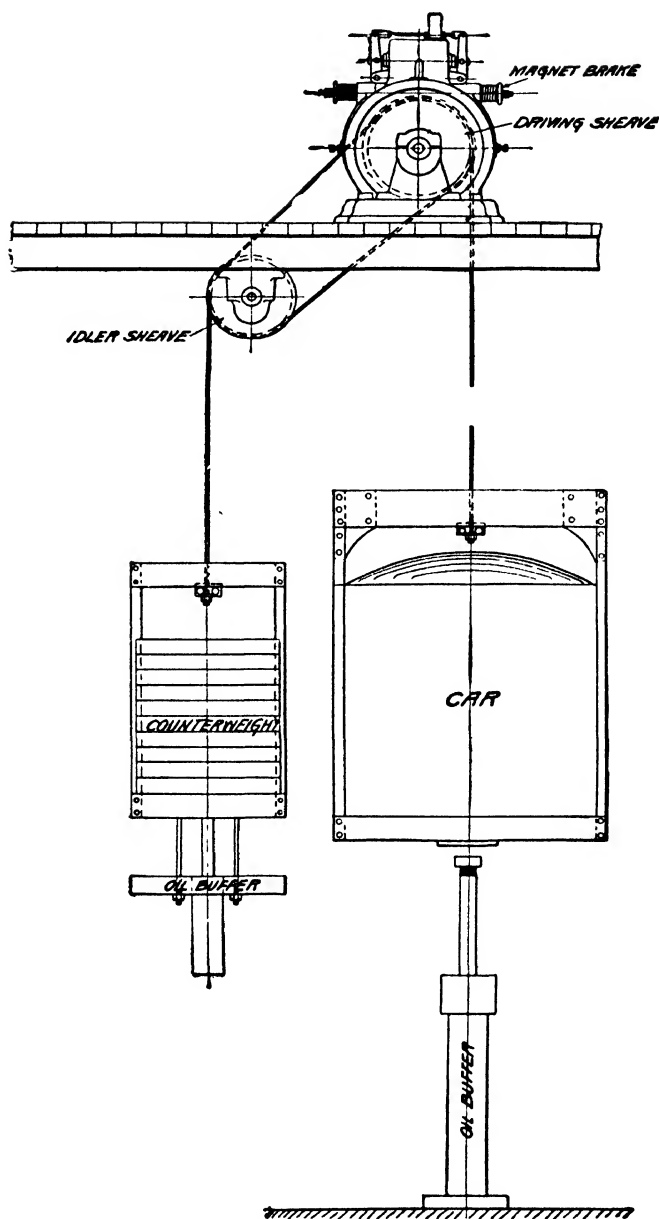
Diagram Showing General Arrangement of Roping for Traction Elevator
